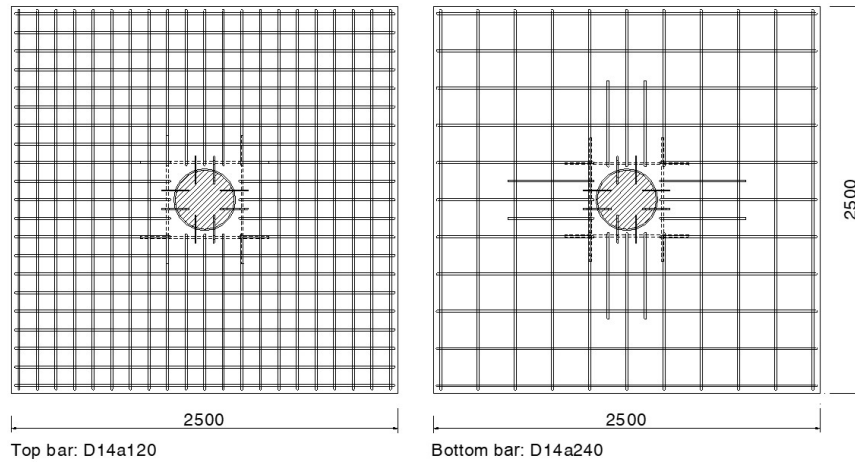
Arrangement of the reinforcement in the slab (dimensions in mm)
